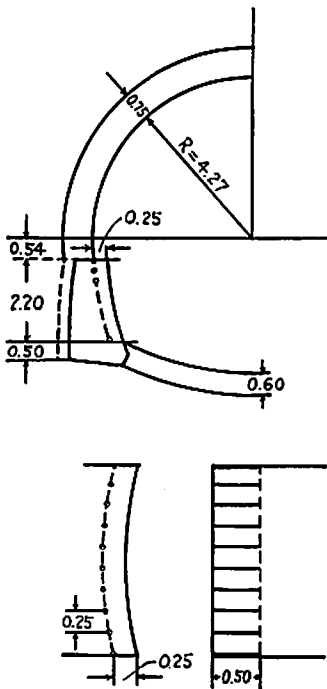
Smooth blasting at the side-wall (concrete) for the Kamui pilot tunnel
